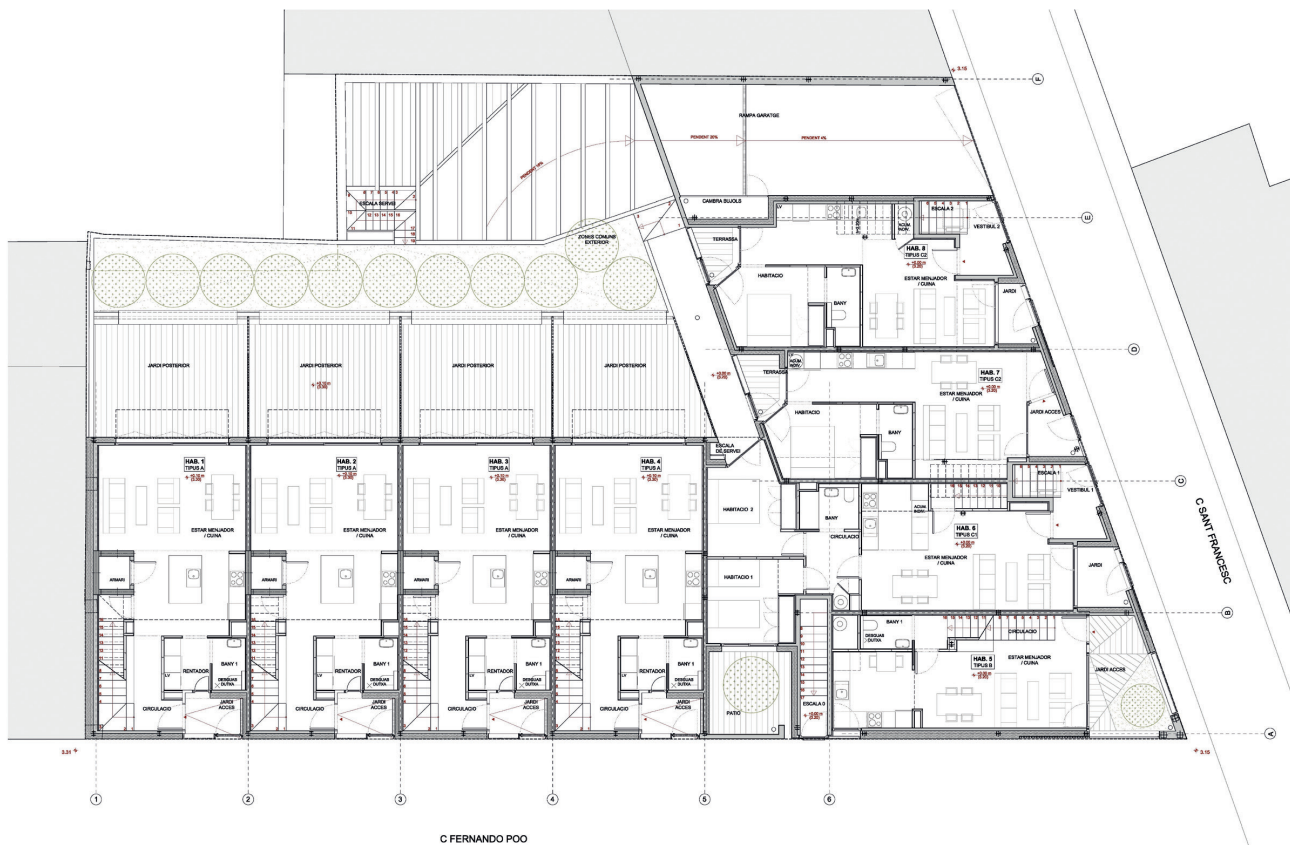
Ground floor plan. 2018. Own elaboration / Figura 2. Plano de planta baja. 2018. Elaboración propia.
